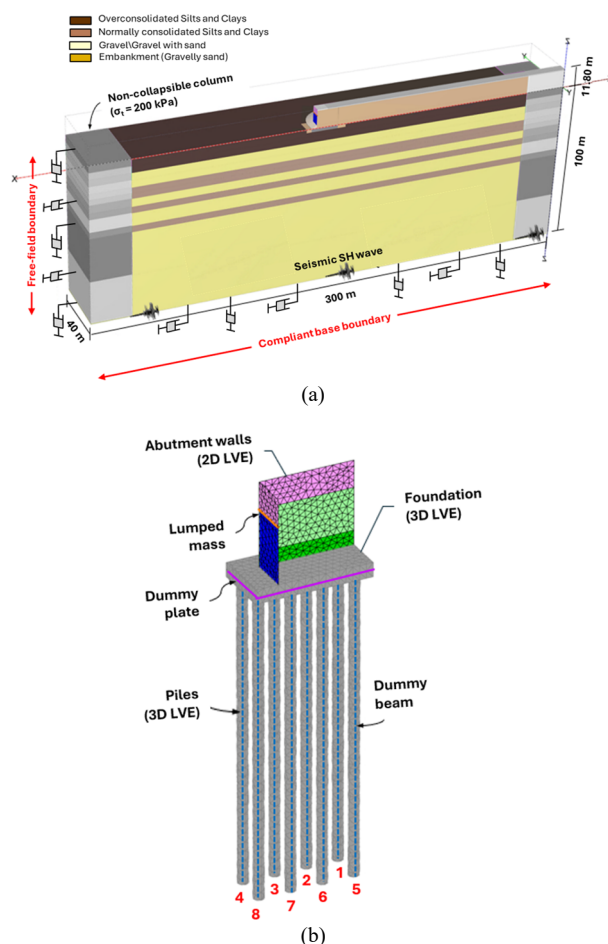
(a) Three-dimensional numerical model and (b) detail of abutment structure and foundations.
